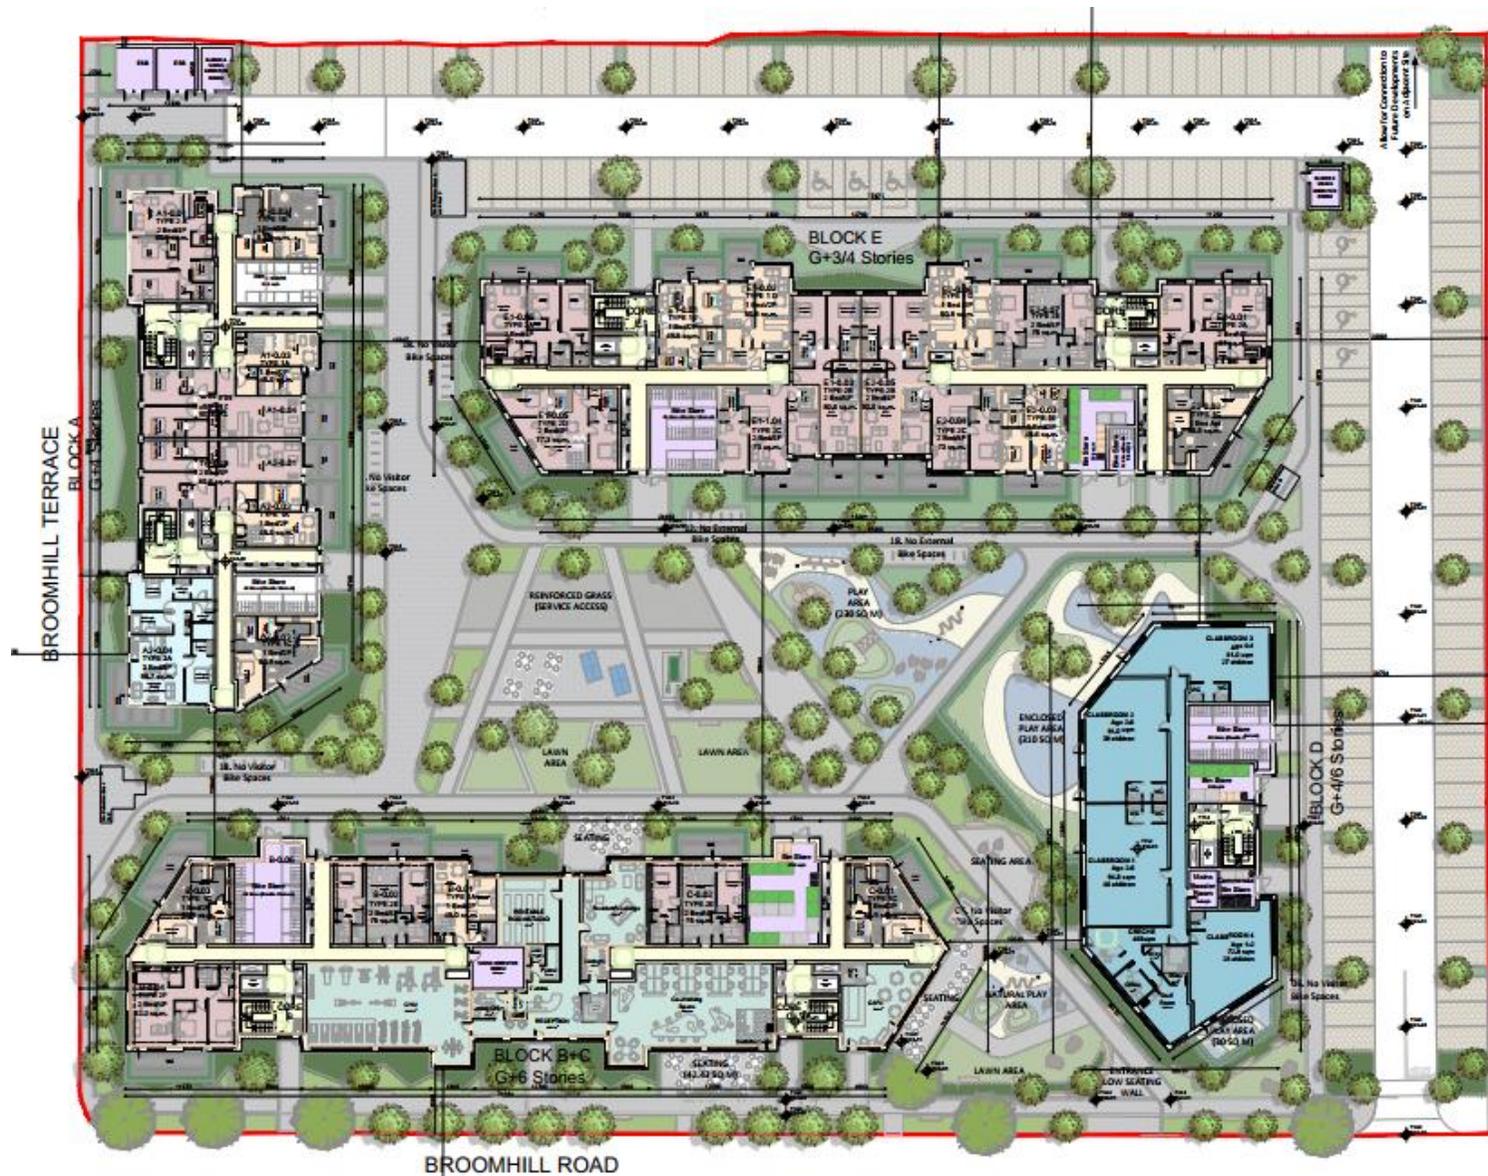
Development at Broomhill Road - Ground floor site plan (Source: John Fleming Architects)
